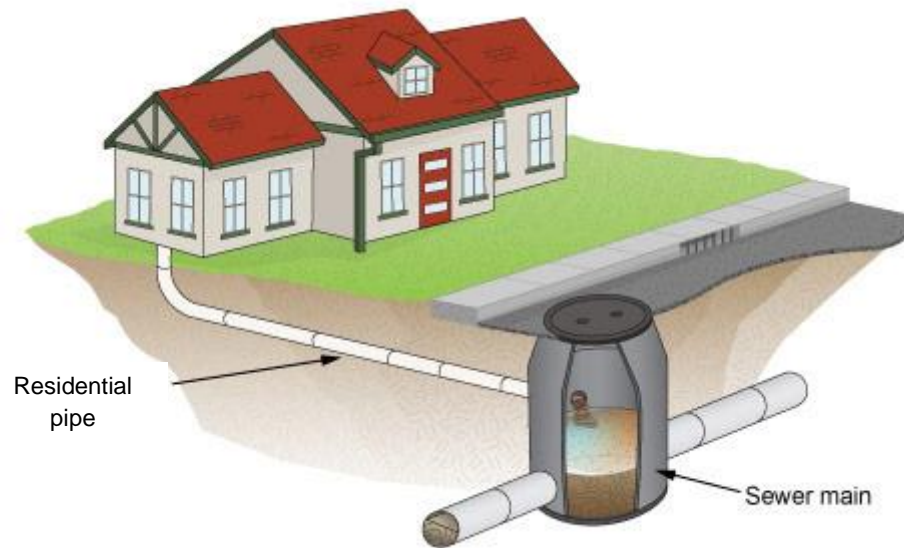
Schematic of a residential sewer pipe connected to the municipal sewer grid.
